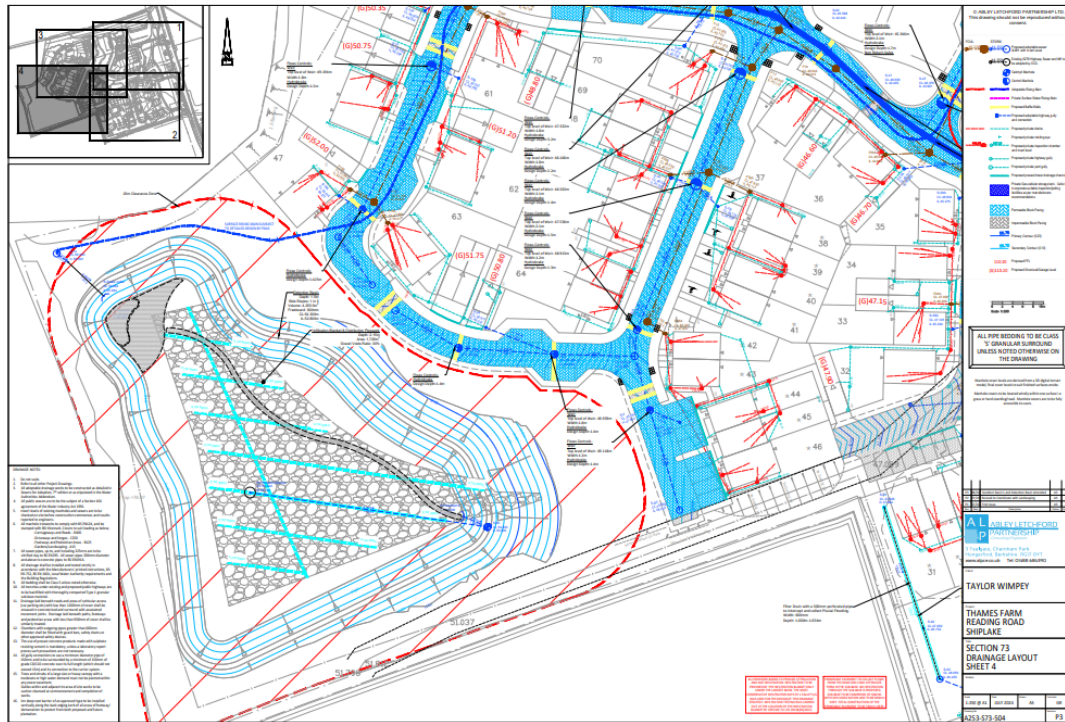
August 2024 drainage layout plan 4 © Taylor Wimpey
